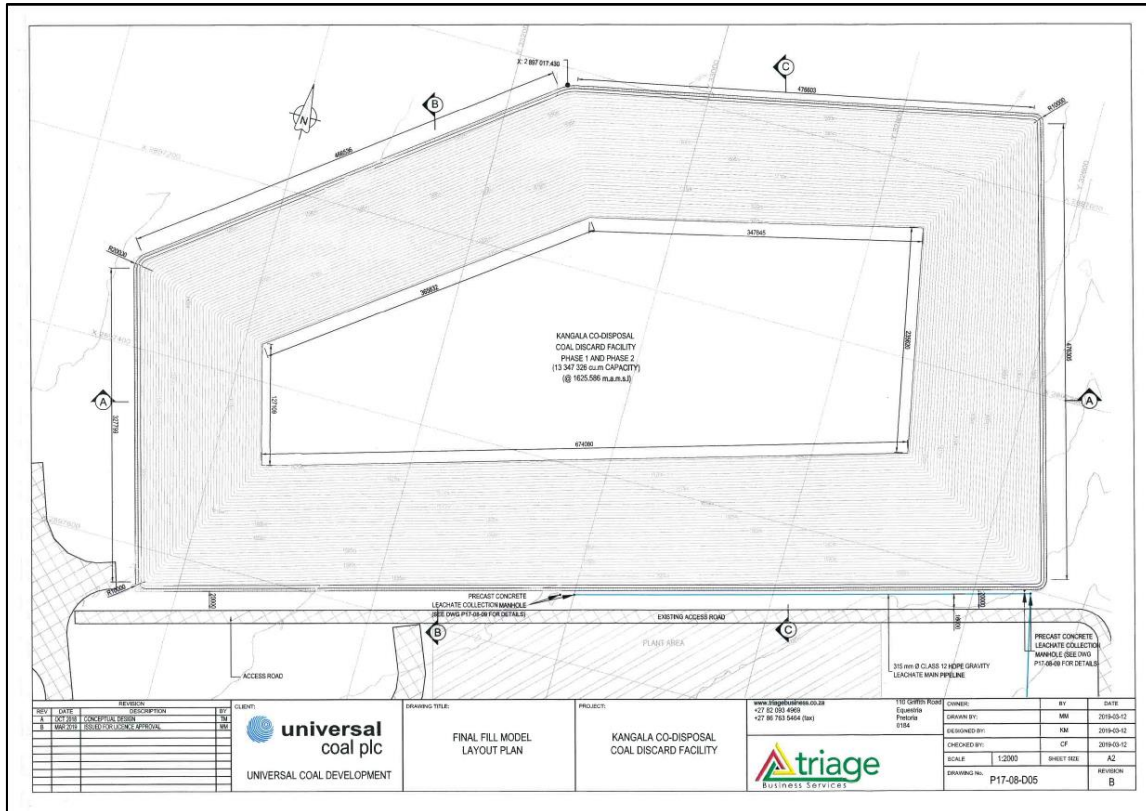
Proposed site plan and layout (provided by EIMS)
